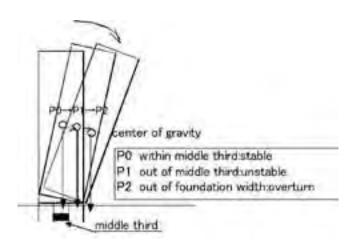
Stability against Overturning of Tower Structure.
